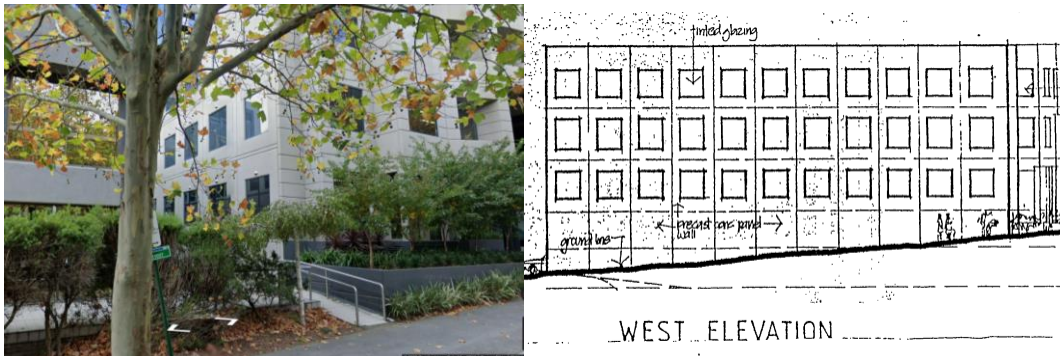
West adjoining property, 18-20 Prospect Street, and plan 'Attachment B in agreement'
